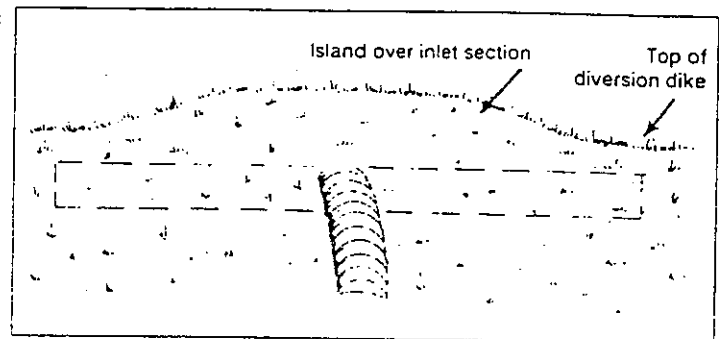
C. Slope drain should have a compacted fill island to prevent overtopping and diversion dike to direct runoff to the drain pipe.
